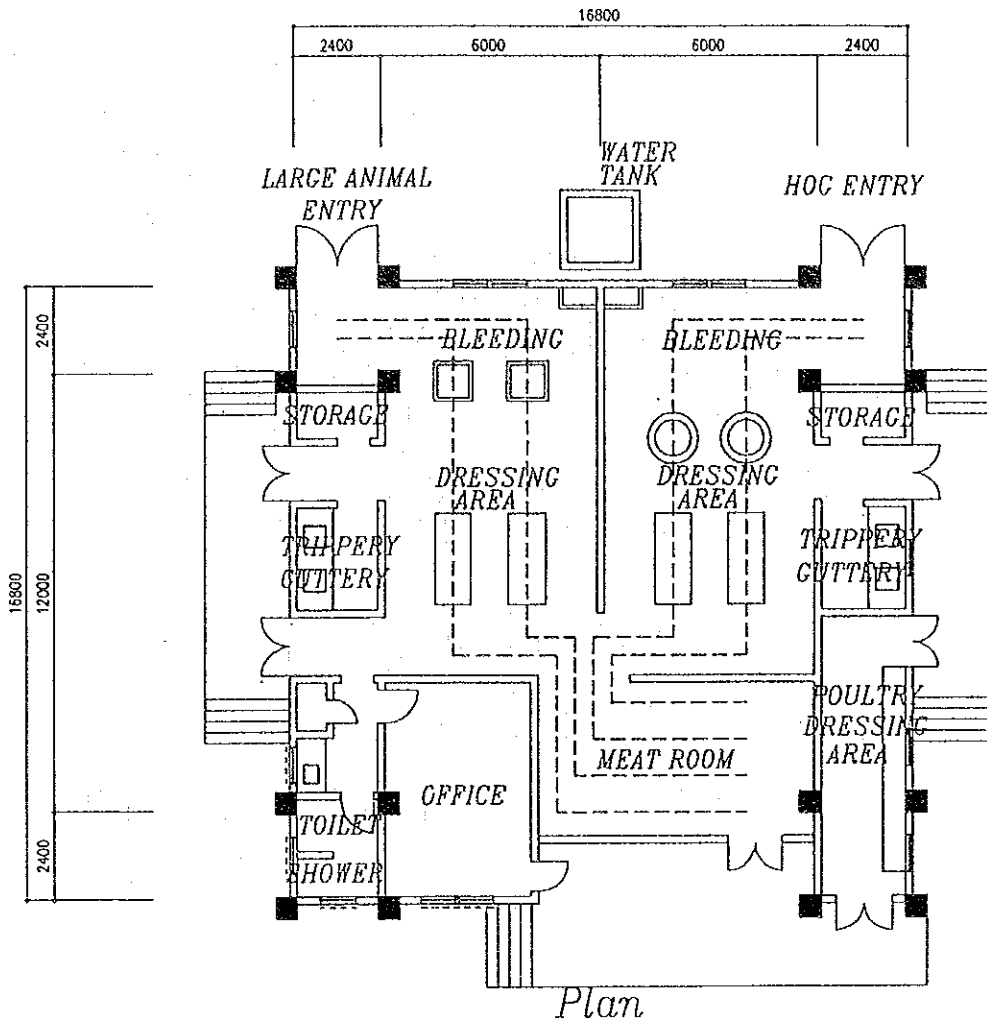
3 - 6 Standard Plan of a Slaughter House
